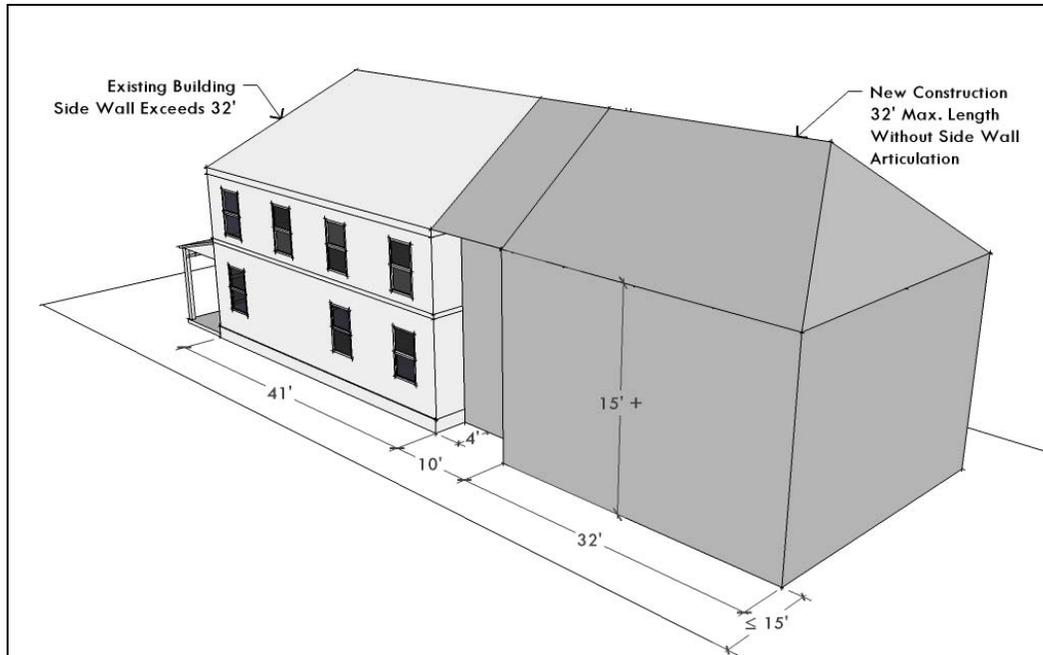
Side Wall Articulation (Existing Side Wall Exceeds 32 Feet)
